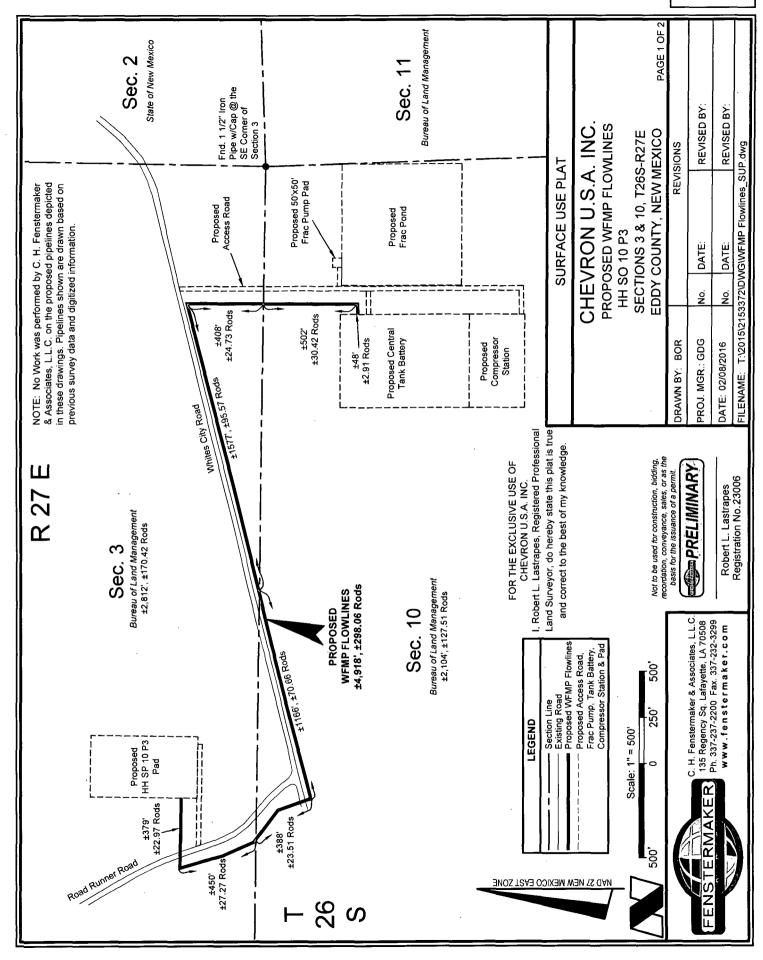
Survey Plat: New or Reconstructed Roads Map: if road is outside 600' x 600'.
